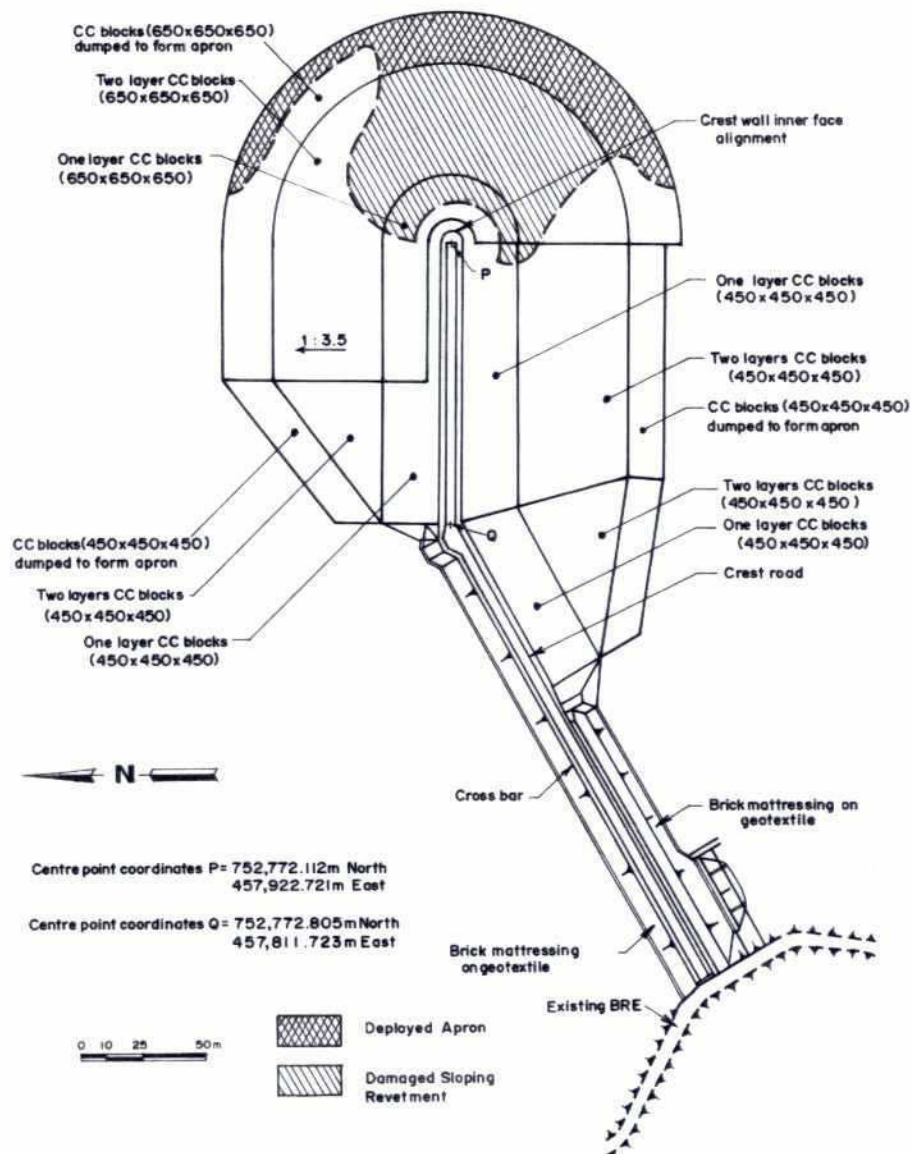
Layout of Kalitola Groyne showing damages which occurred in 1999
